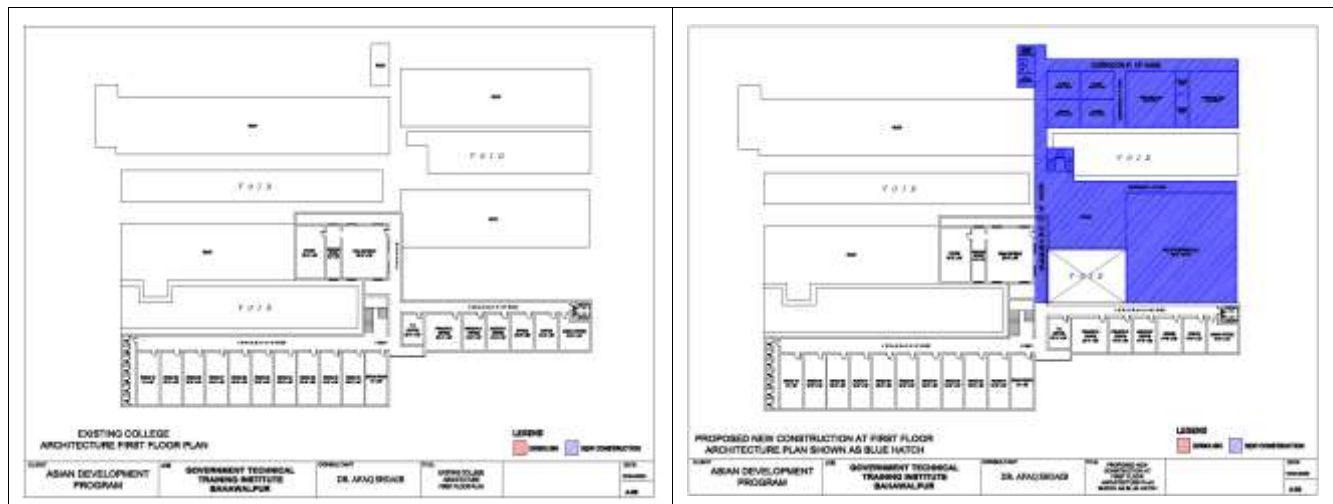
A: Designed Layout plan new facilities (MP Hall, class rooms/labs) GTTI, Bahawalpur
